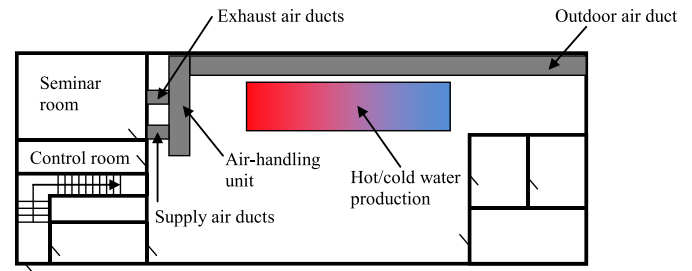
Layout of the test facility, including the seminar room, a control room and an open hall.
